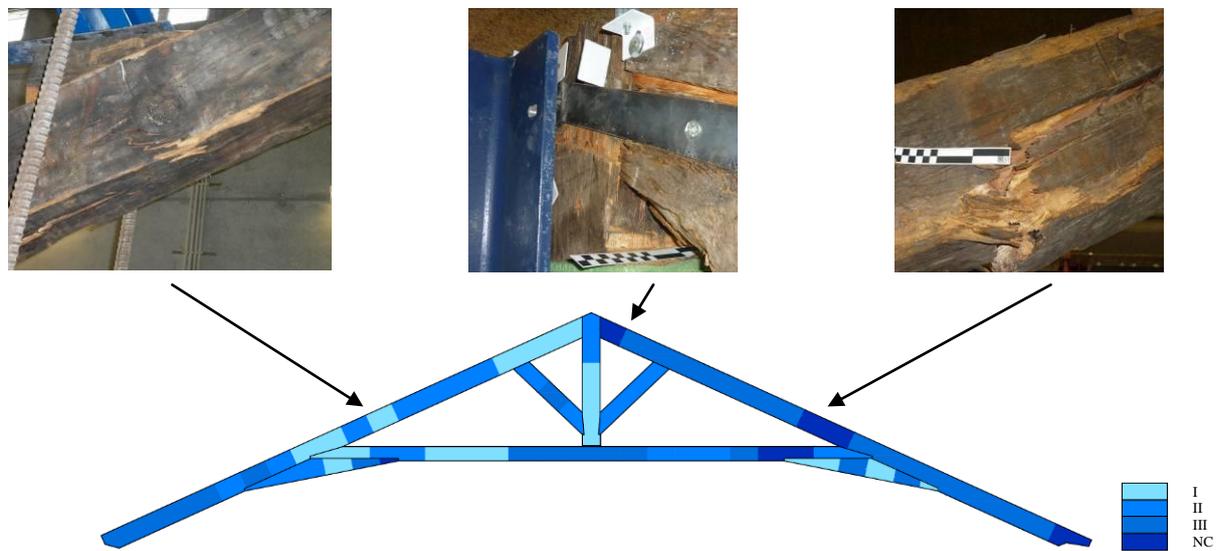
Visual grading of truss T2 with details of the failure of the rafters and of the post-rafter connection.
